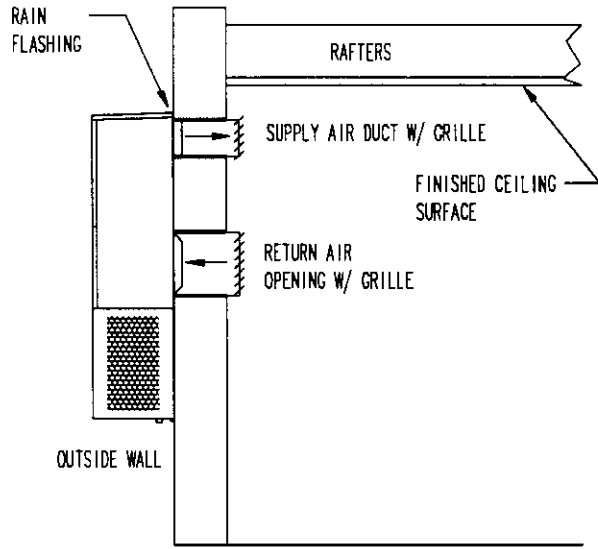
WALL MOUNTING INSTRUCTIONS
